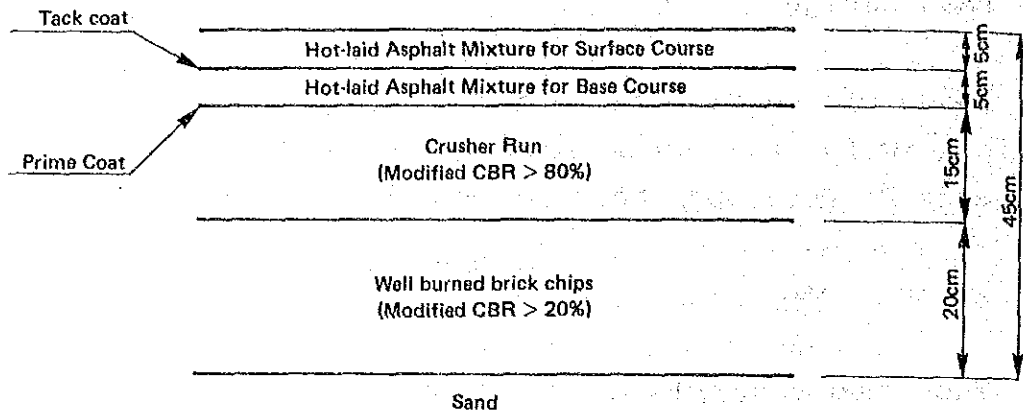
Sectional Paving Structure of the Access Road
